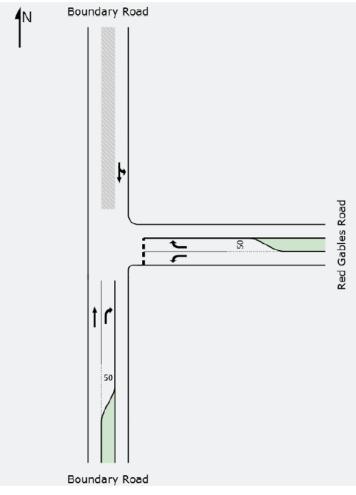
Intersection 7 – T Intersection – Boundary Road / Red Gables Road
